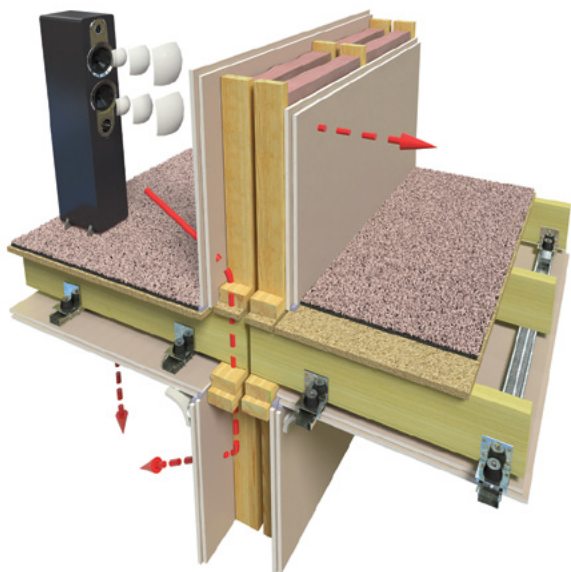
Flanking and Airborne Noise Pathways Through Floor/Wall Junction
